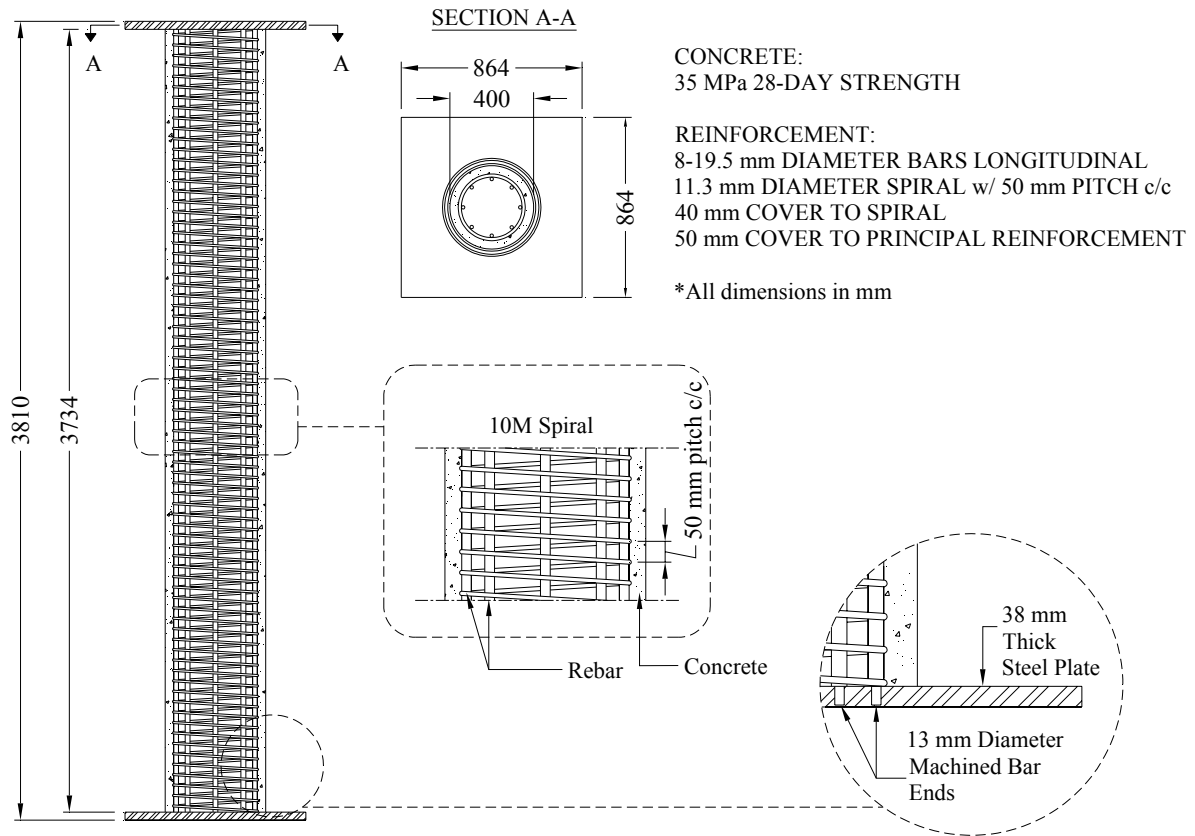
Elevation and cross-sectional details of Column 3 and Column 4 prior to strengthening
